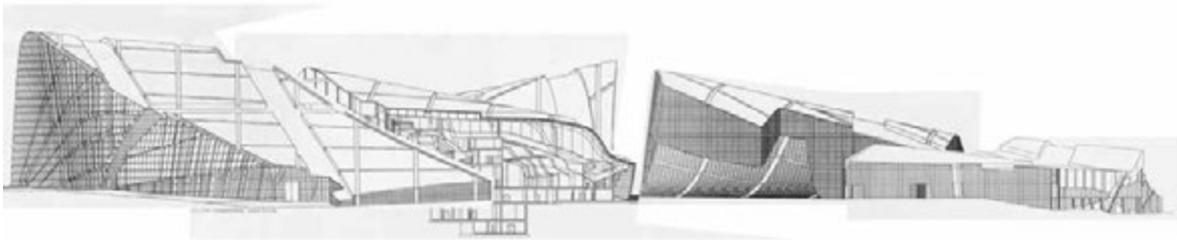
Collage of Elevations and Cross Sections 1:2'000
